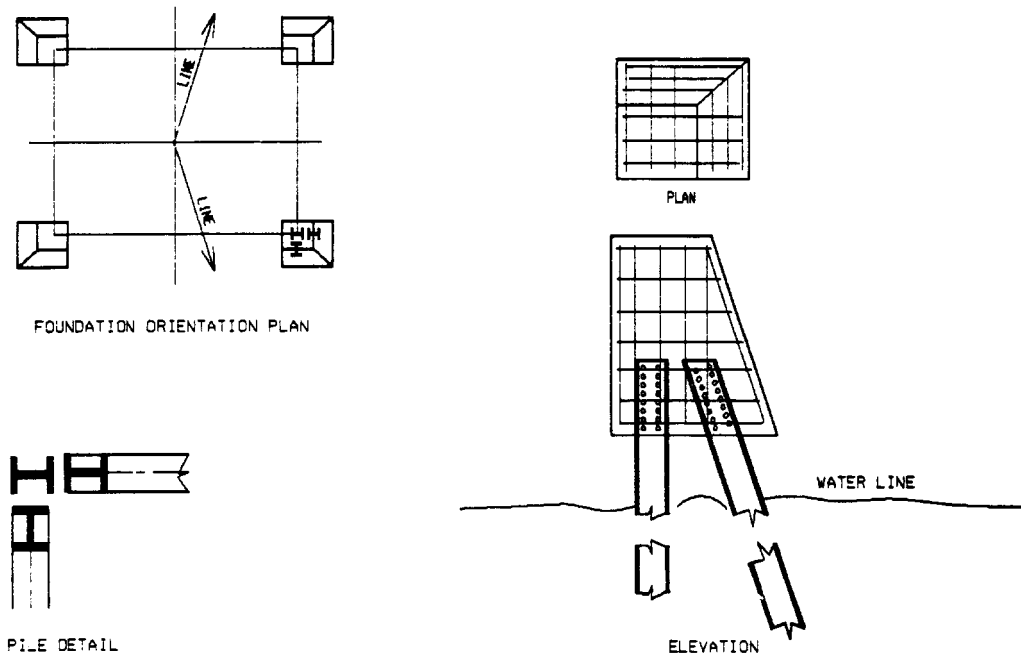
Multi-Battered Steel Pile Capped Foundation
